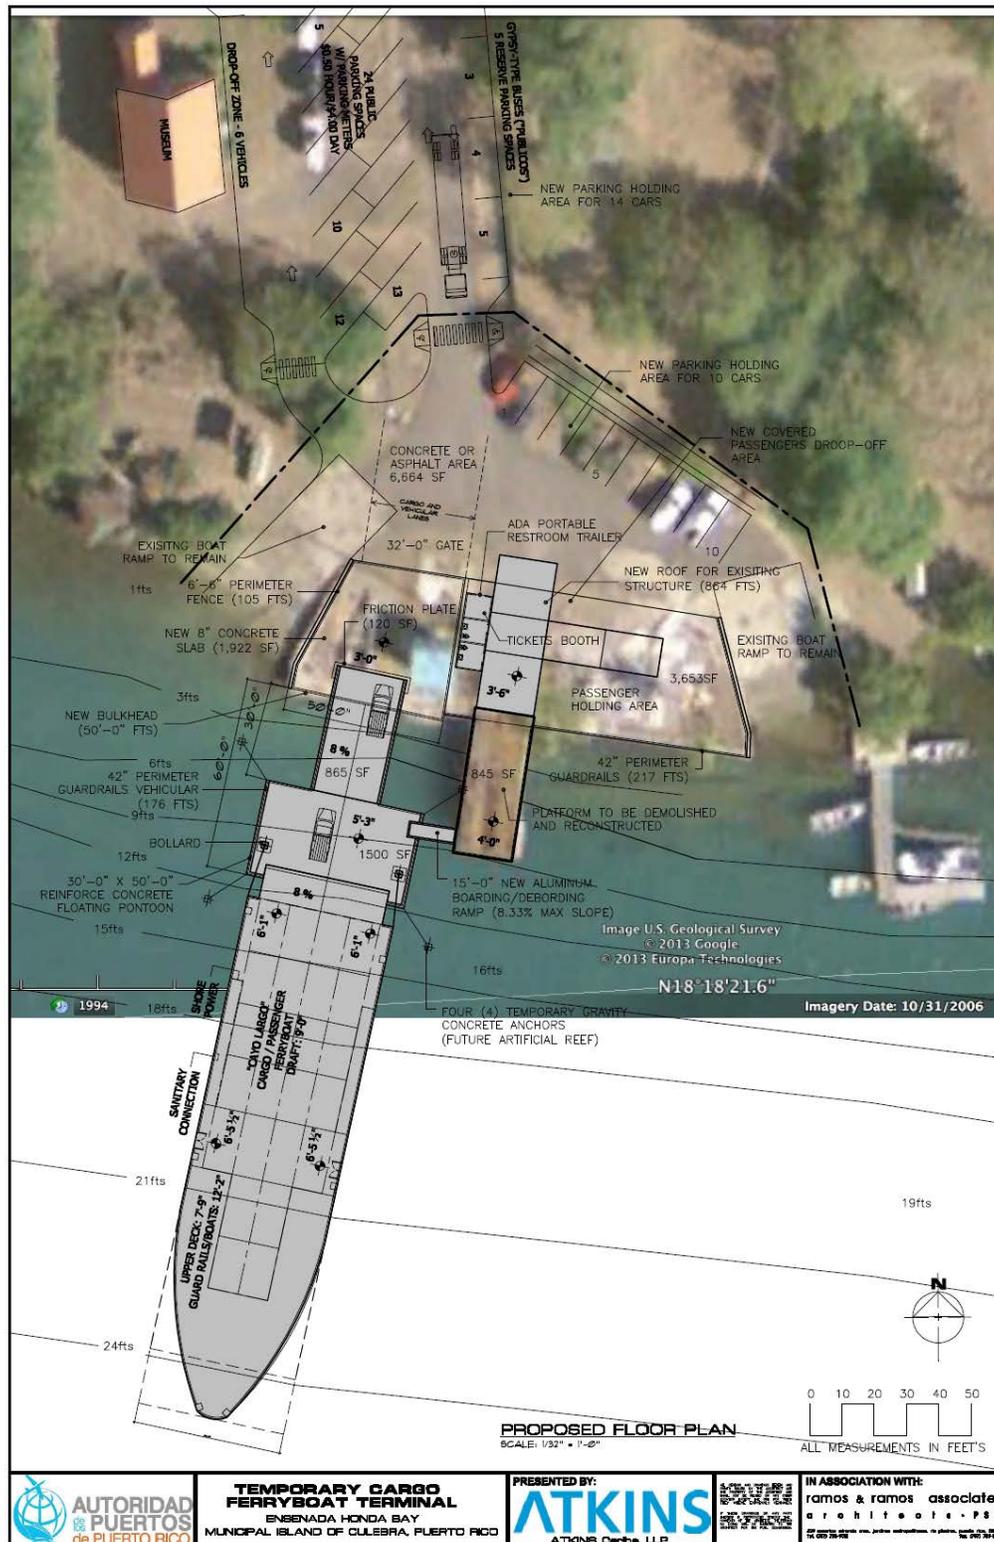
Proposed facilities and improvements for the San Ildefonso pier.
